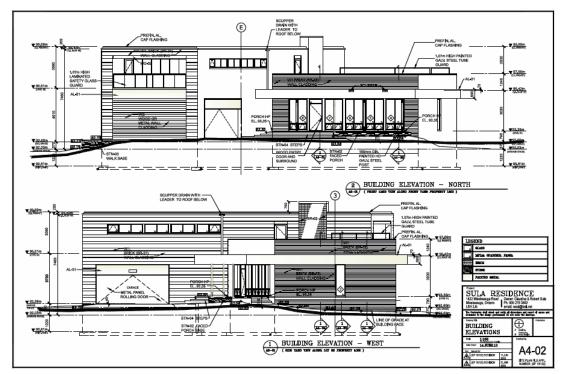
Proposed residence at 1422 Mississauga Road, north and west elevations. (Image provided by the property owner.)
